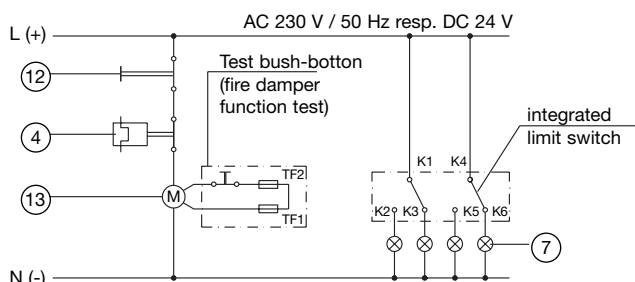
Fire damper with spring return actuator, type FK-K90 with spring return actuator type BF shown
